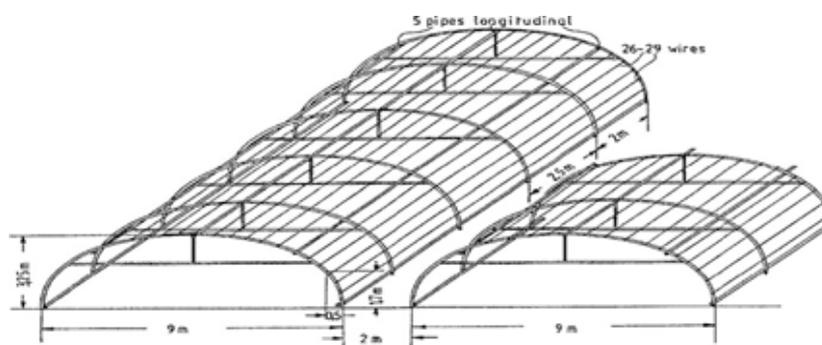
Round-arched tunnel greenhouse without solid foundation, not properly anchored in the soil
